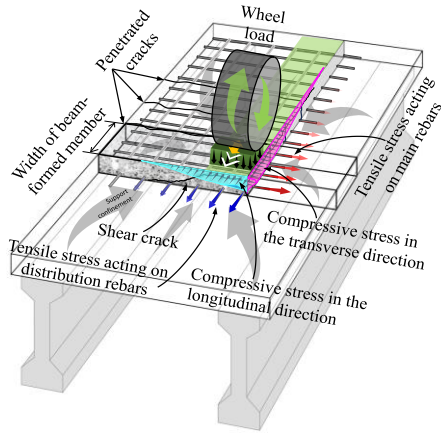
Shear bearing capacity mechanism of beam-formed member in the RC bridge deck slab under moving wheel load
